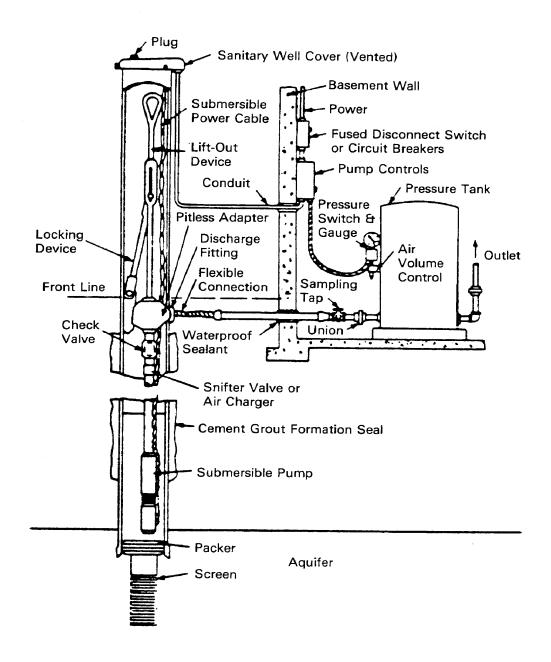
Pit-less Adapter with Submersible Pump Installation for Basement Storage
